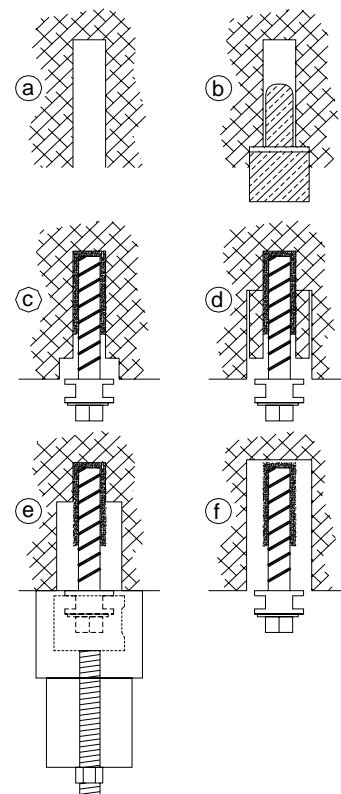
Bolt installation, pull test and overcoring procedure for offset head and standard bolts. (a) 1-inch bolt hole. (b) Overcore starter hole drilled using a pilot bit. (c) Bolt installation, without roof bolt plate. (d) Bolt overcored to within 12-inches of the top of the bolt using an NX (3-inch OD) bit. (e) Bolt pull tested. (f) Bolt overcored and removed from the roof for inspection. Drawings not to scale. SEPT bolt testing procedure similar, except the bolts were installed using a 12 inch equivalent resin length, step d was eliminated and the entire length of the bolt was overcored in step f.
